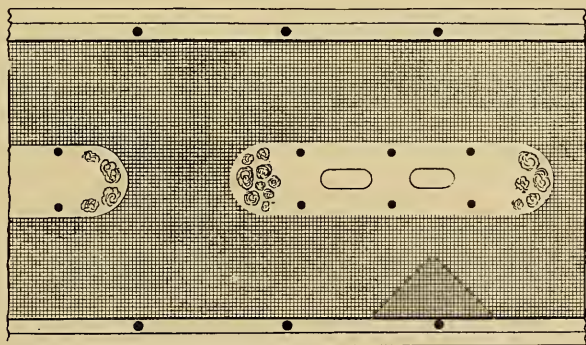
Plan of street with parkway and 6-foot tree belt.
